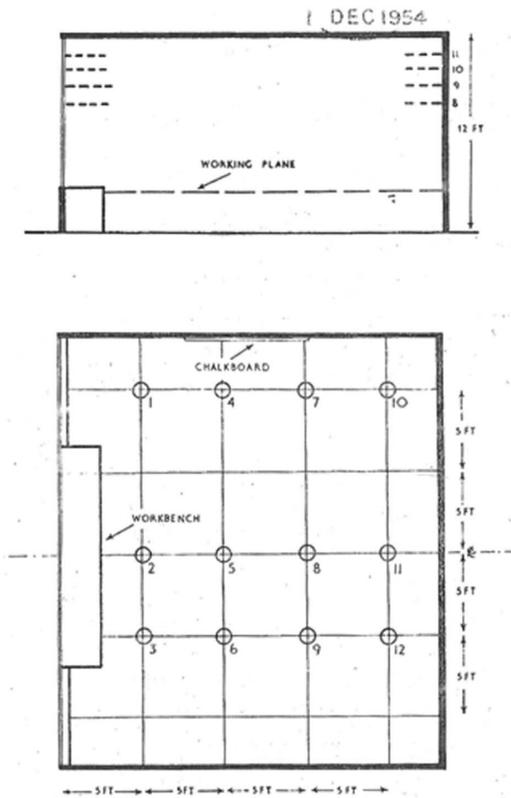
Plan and section of the classroom showing position of the photocells. Distanced 5ft (1.52 m) from the window-wall and between one another.
